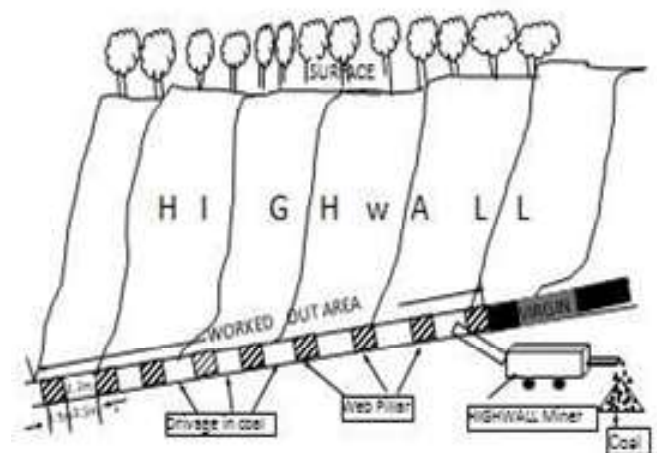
High Wall Mining Layout in Extraction of Thin Seam
